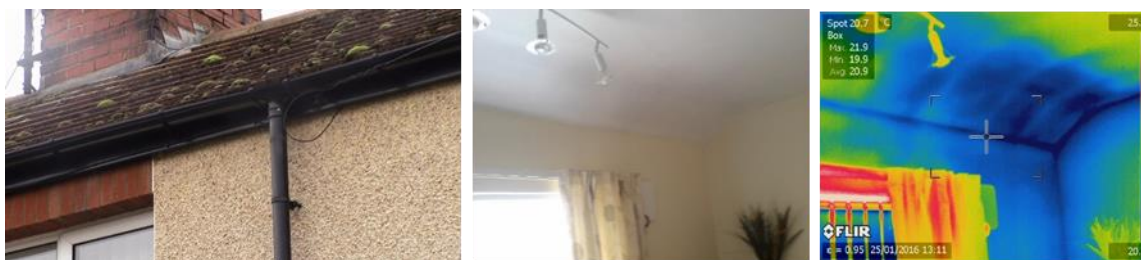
Thermal breaks introduced to top floor wall/ceiling junctions: the above three pictures are of the same property and show a typical 1919-1940s solid brick semis and terraces where the top floor is partially in the roof void with a sloping ceiling against the rafters
